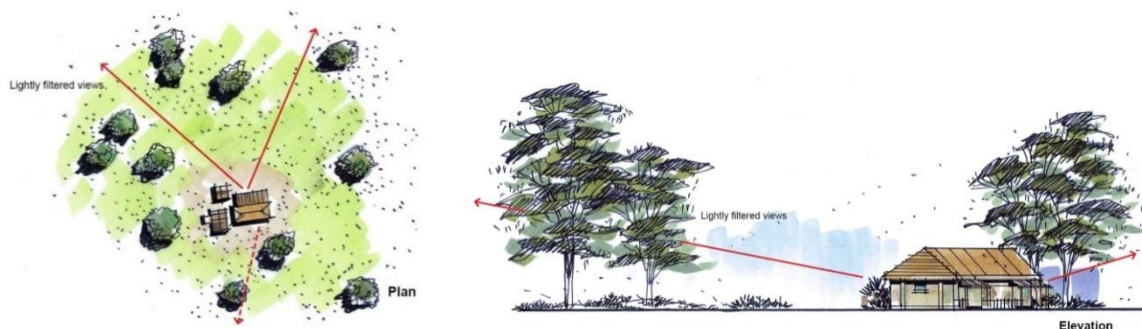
Typology 1 – Minimally screened. Typical plan and elevation.
